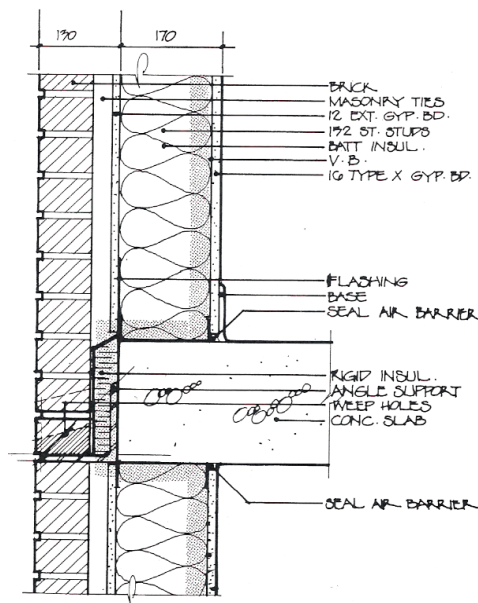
Blueprint drawing of exterior brick wall (dimensions are in mm) [3.1]
